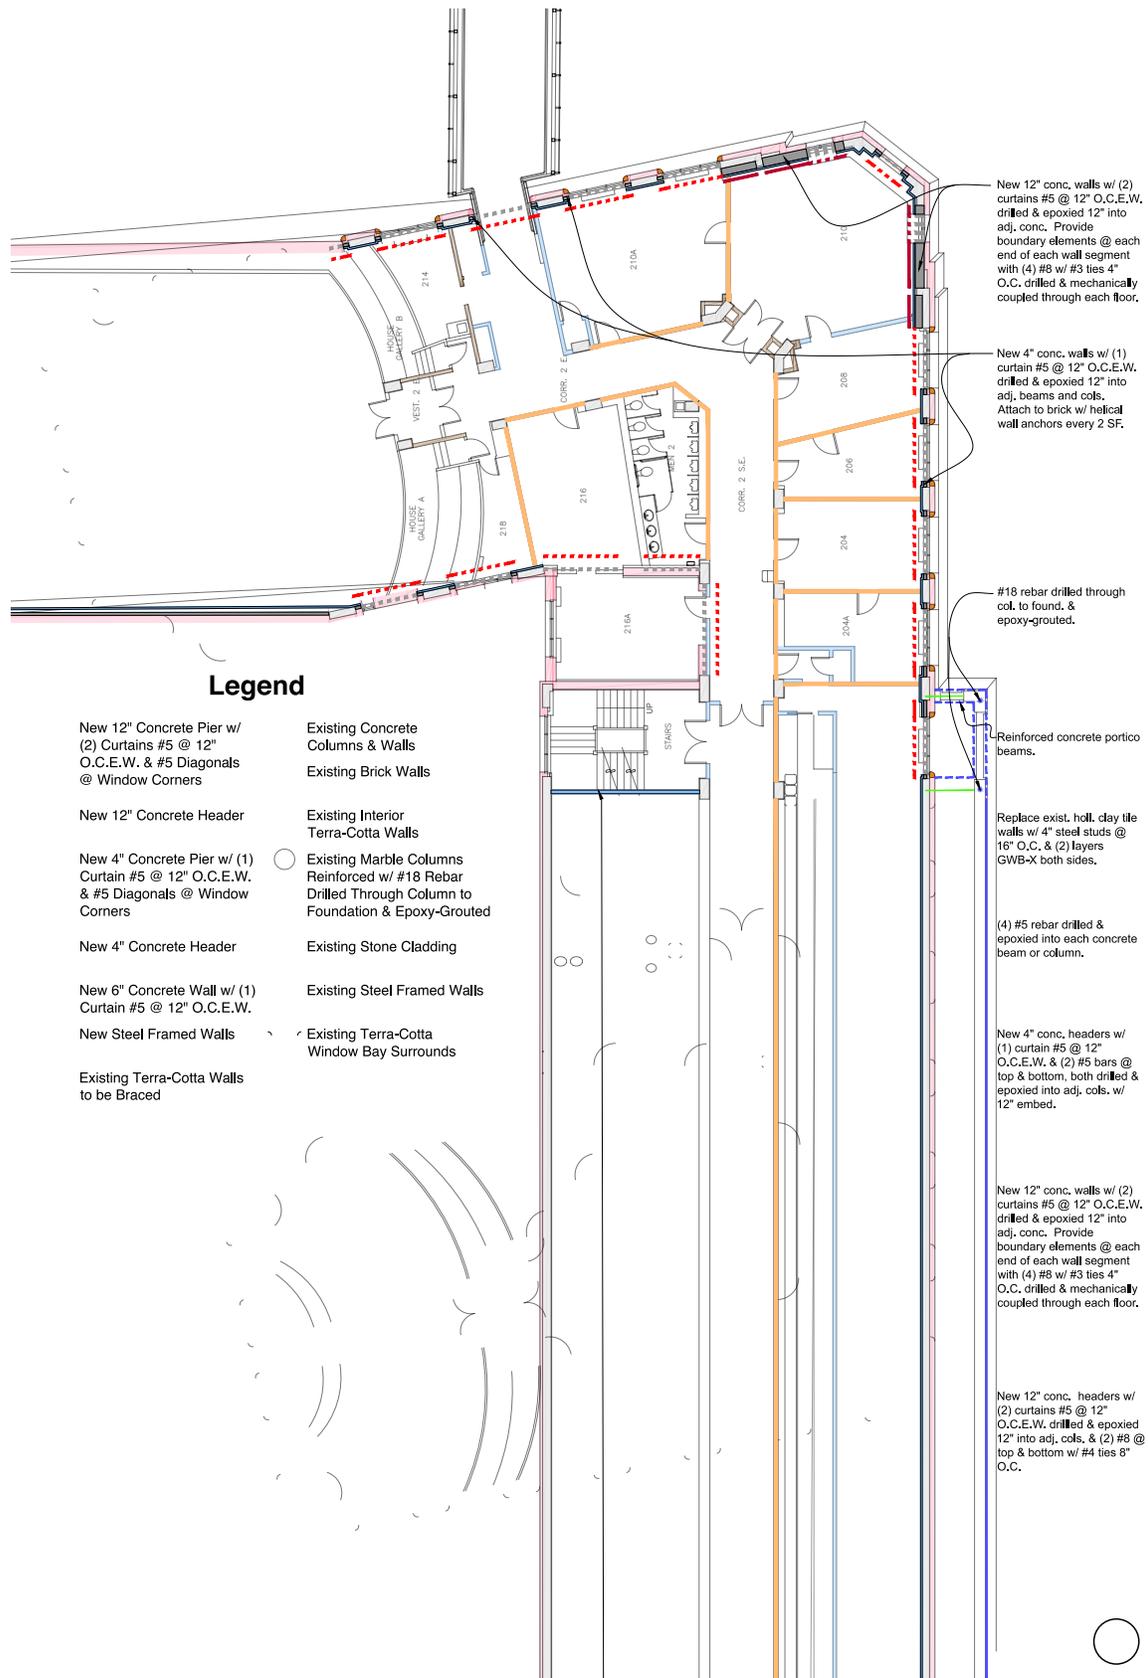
(5): Structural Reinforcing of Building Frame - Floor Level 2
